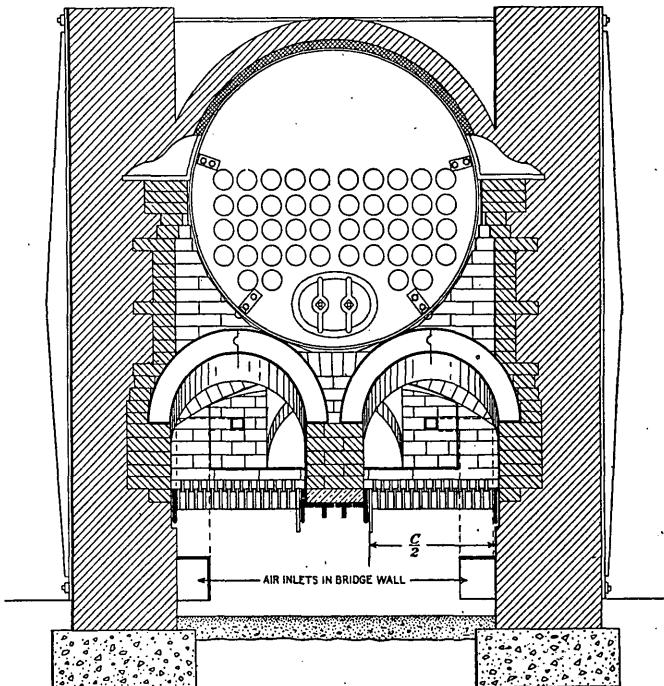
A hand-fired furnace and return tubular boiler, cross section.
